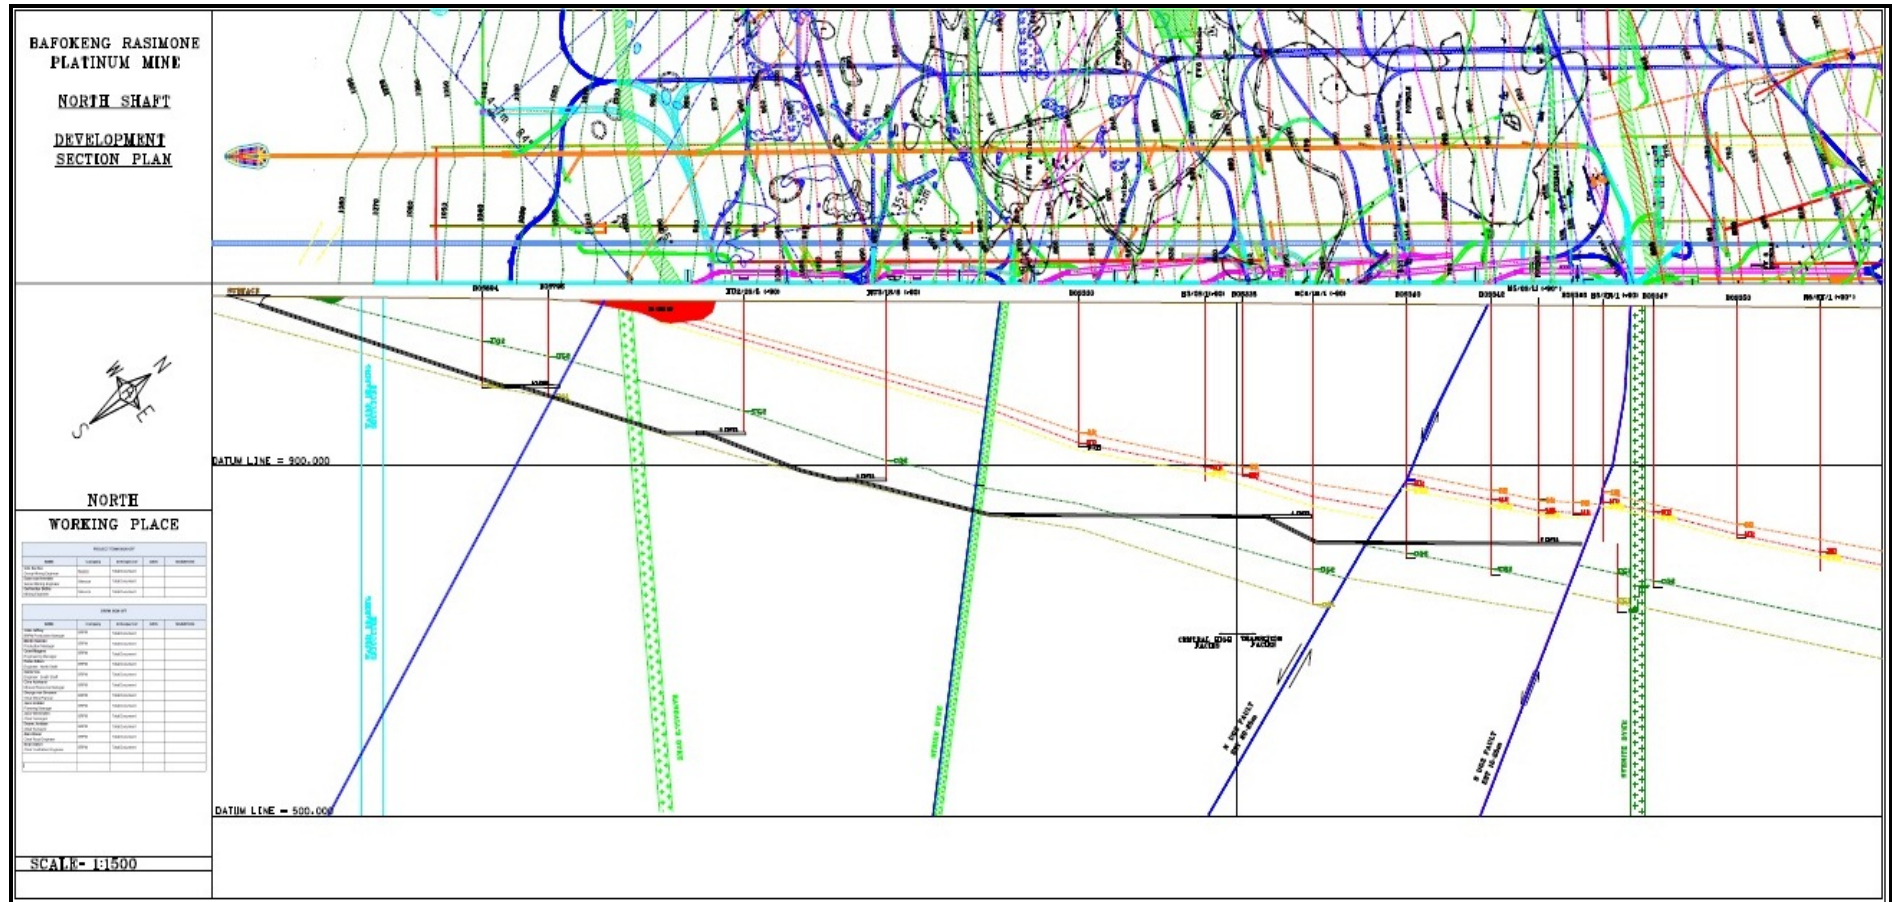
Plan and Section View of the North Shaft Chairlift Decline System (design) (BRPM, 2013)
